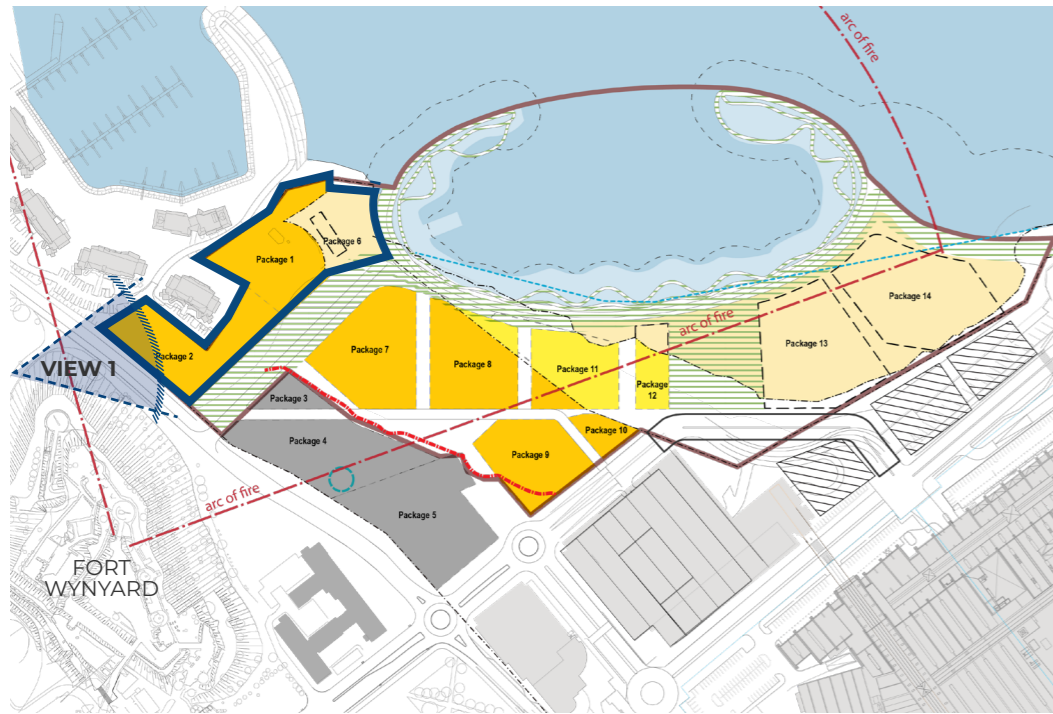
LOCALITY PLAN, VIEW 1: PACKAGE 1, 2 & 6
